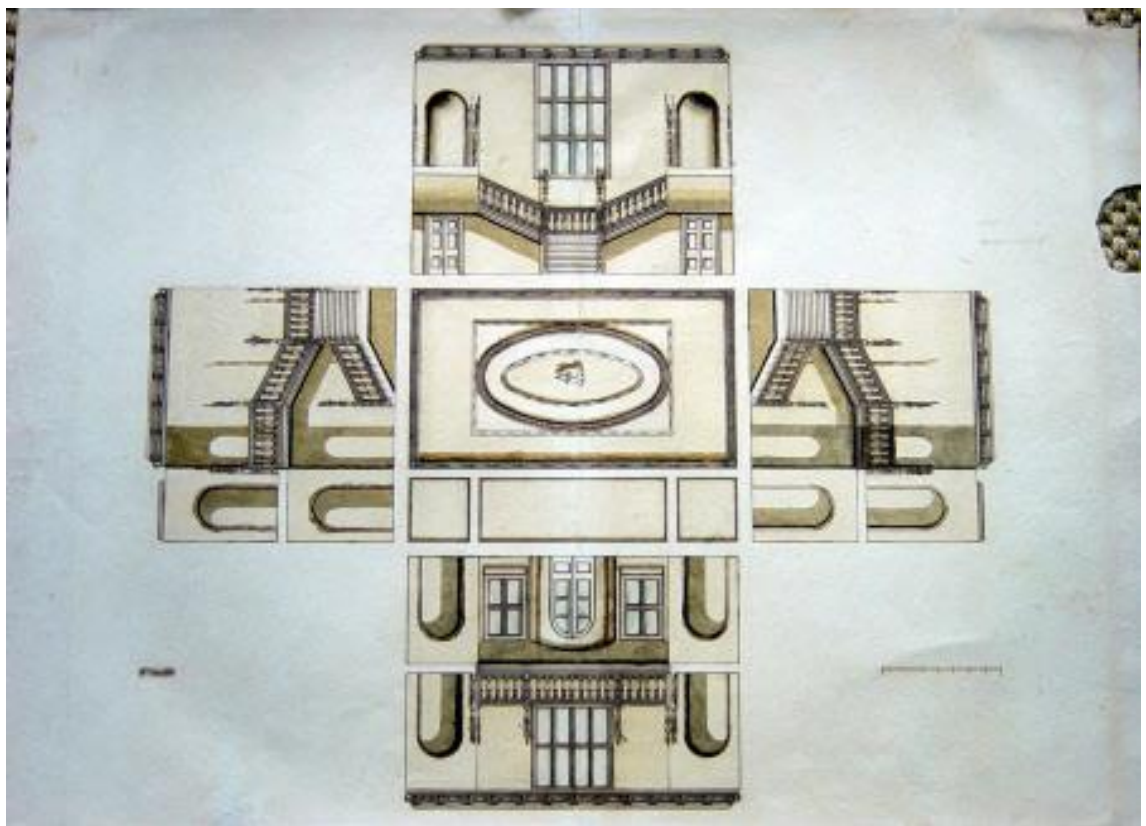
William Ivory, Album No. 12. Ceiling plan and elevation for the remodelling of the Great Hall as a stair hall, Blickling Hall (Norfolk), 1765. Pen and ink on paper. National Trust. Accessed Aug 20, 2019, <http://www.nationaltrustcollections.org.uk/object/353776>
